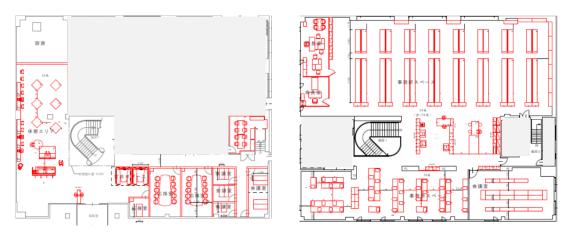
Current office layout (left: 1st floor; right: 2nd floor)
